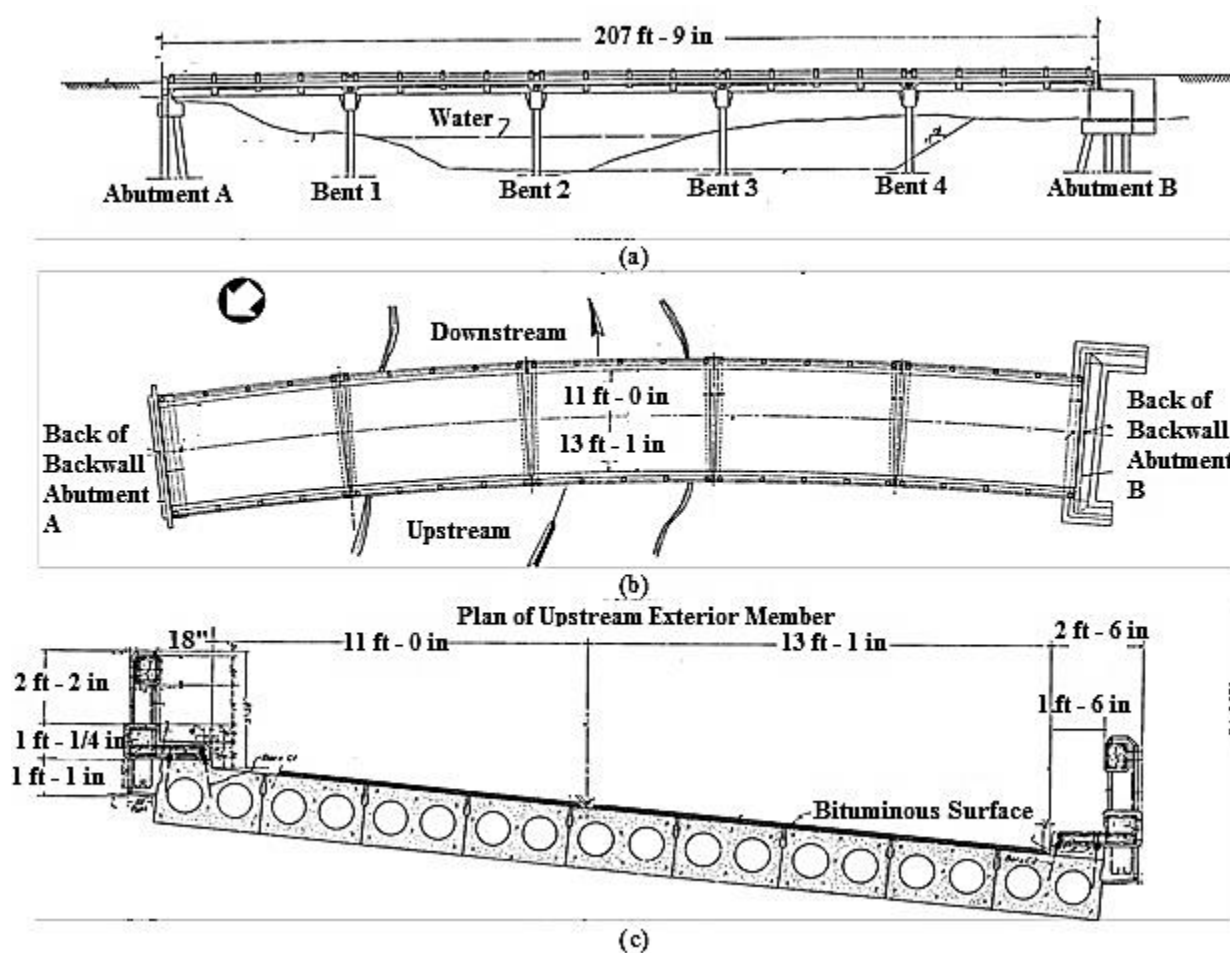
Layout of Adkins Road Bridge: (a) Elevation, (b) Plan, and (c) Cross-Section Views
